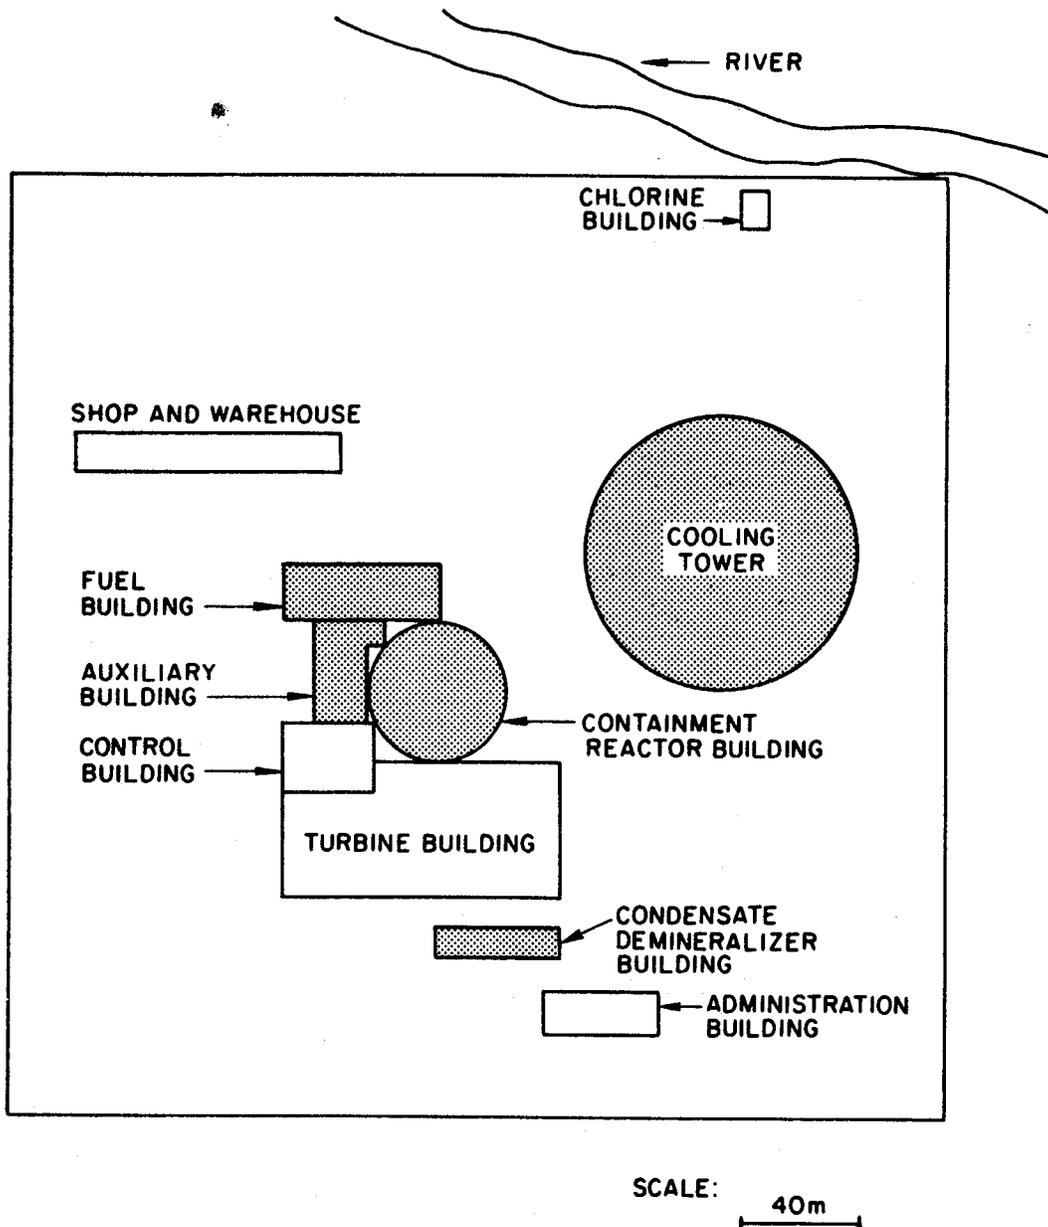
Reference reactor site used for illustrating termination survey application. Shaded structures are assumed to be removed during decontamination. Actual structures retained will depend upon the specific site.
